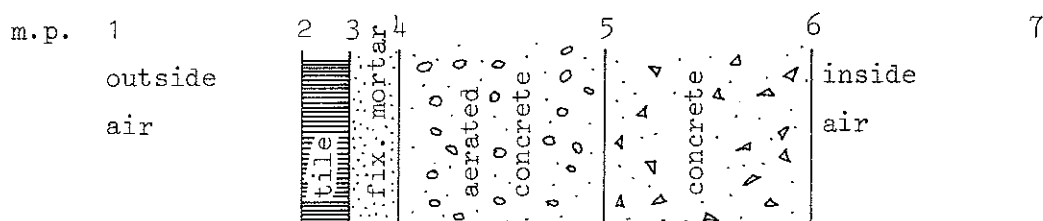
Positions of temperature sensors in a typical wall section
